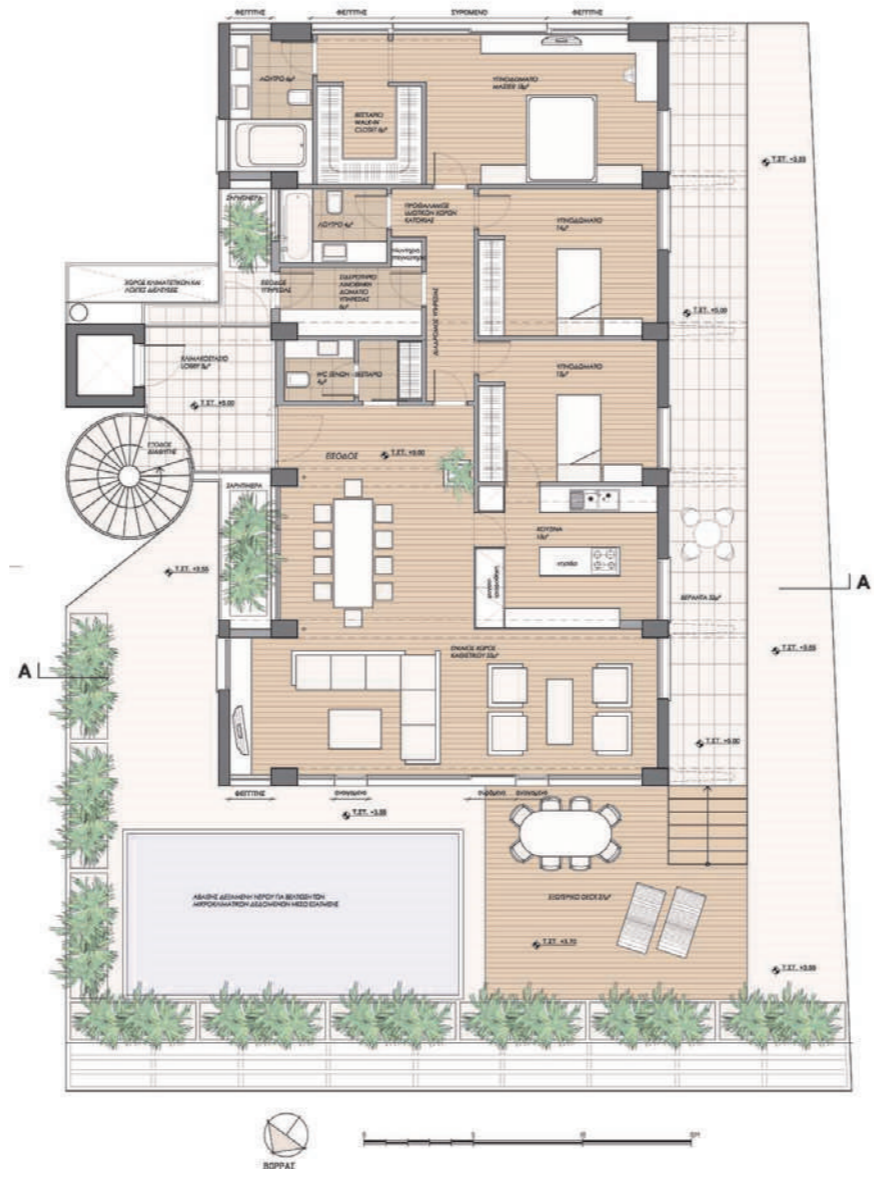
Floor plans after interventions. The planted areas and the the shallow pool. © A. Michael's archive.
